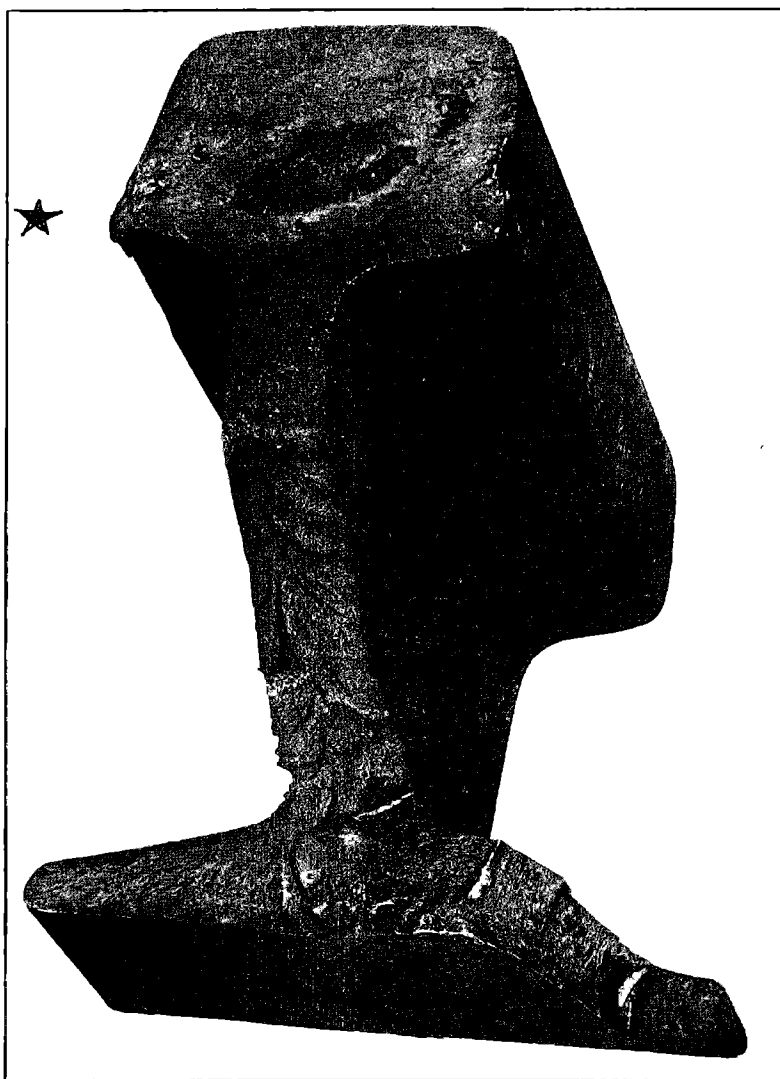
Leaving end of short fragment of rail B. Fracture started at lower corner of head, gauge side
